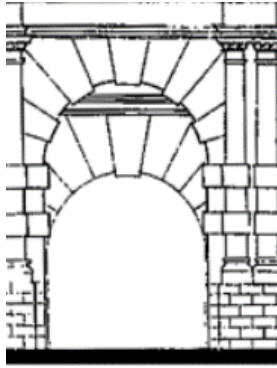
Voussoir arches dominating the ground floor creating arcades in Ipoh station building
